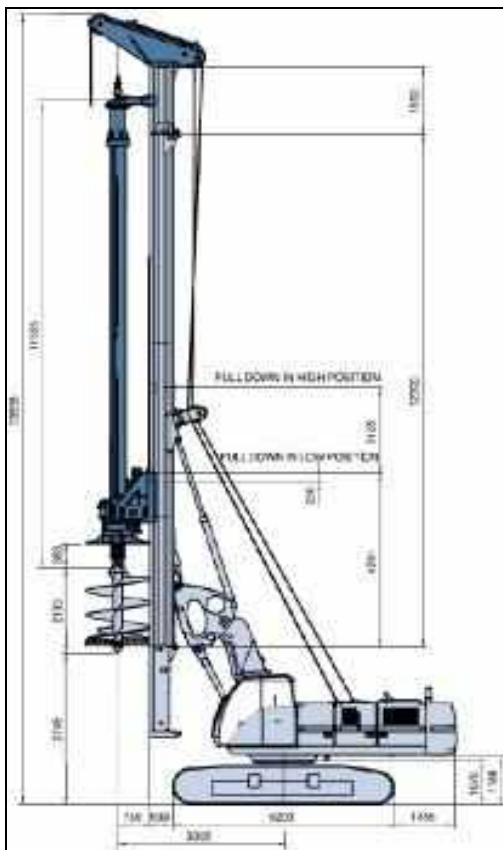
FOUNDATION AND SUB-STRUCTURE CONSTRUCTION METHOD
